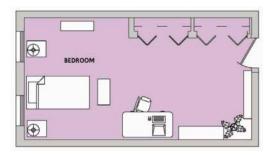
Floor Plan of Traditional Single Occupancy Room
